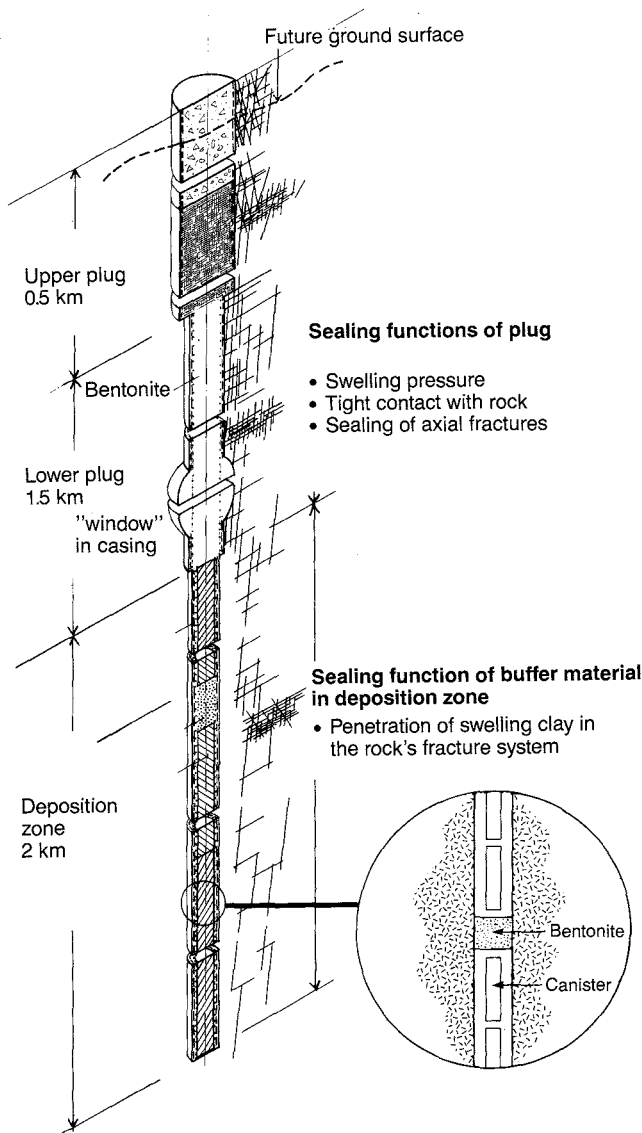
Deep deposition hole. Sealing with swelling clays will be carried out in connection with drilling and deposition.
